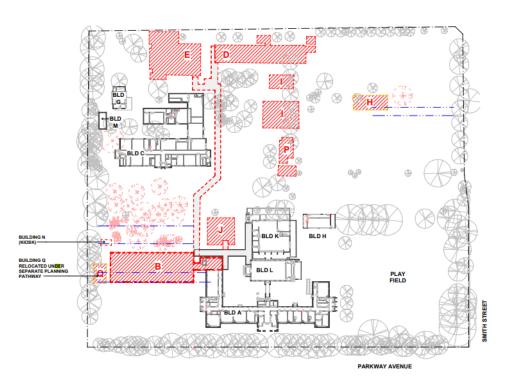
Extract of Demolition Plan (DWG No. DA-0-014) (source: EJE Architecture)
